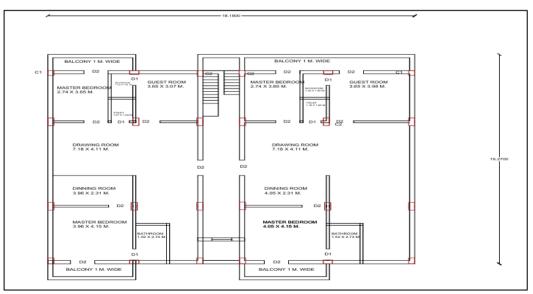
Typical Plan of building having conventional sizes of column and beam
